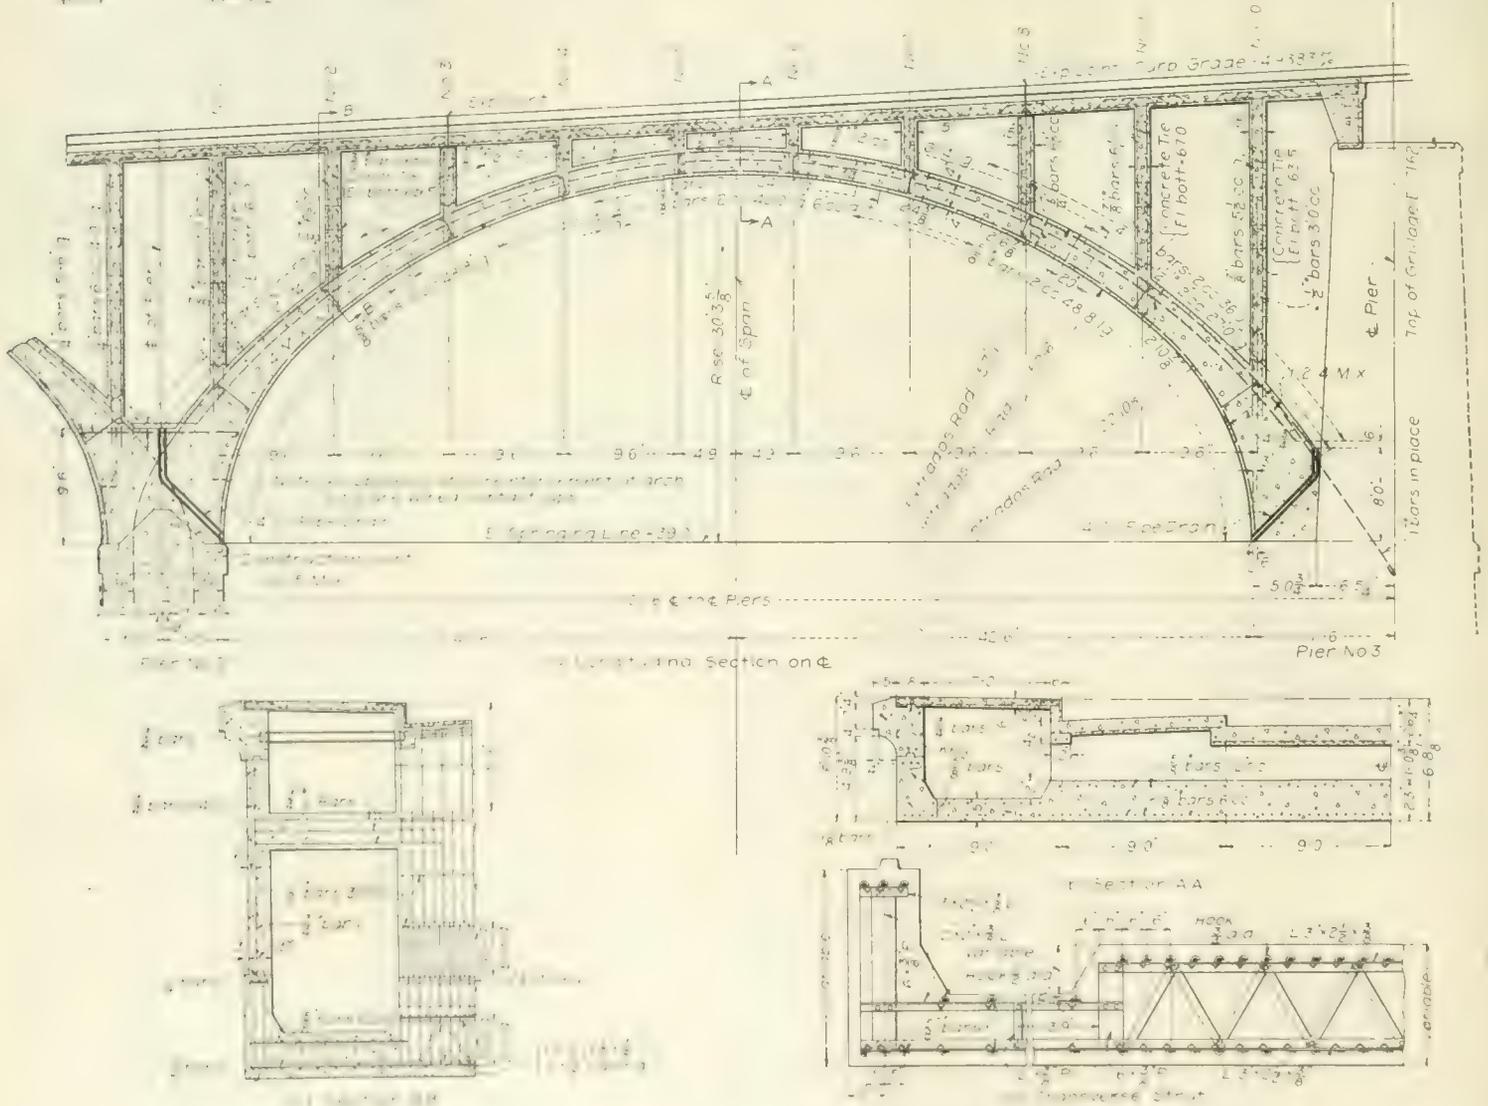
Longitudinal and Cross Sections of 85-Ft. Reinforced Concrete Arch Spans in Approaches of North Side Point Bridge, Pittsburgh, Pa.
